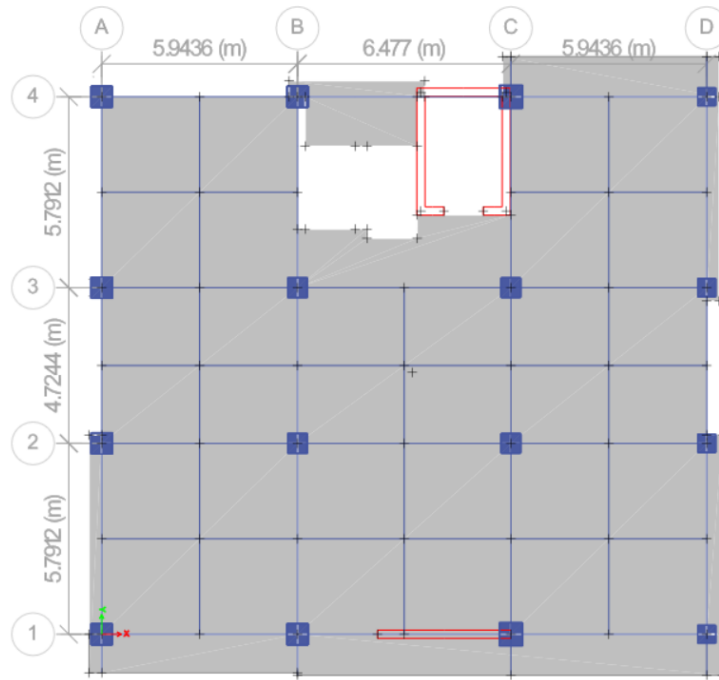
Typical floor plan of the G+4 commercial RCC building.
